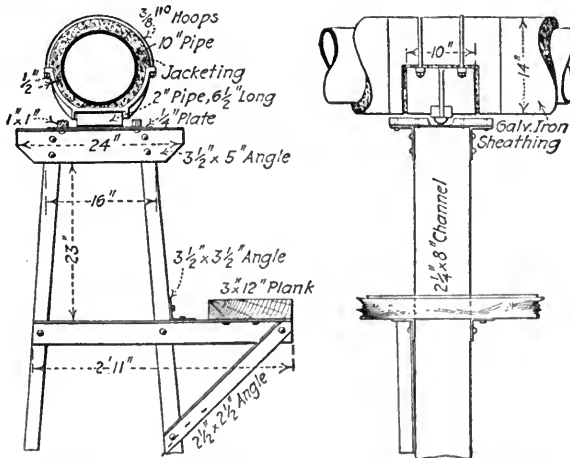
TOP OF A BENT CARRYING A STEAM PIPE.
